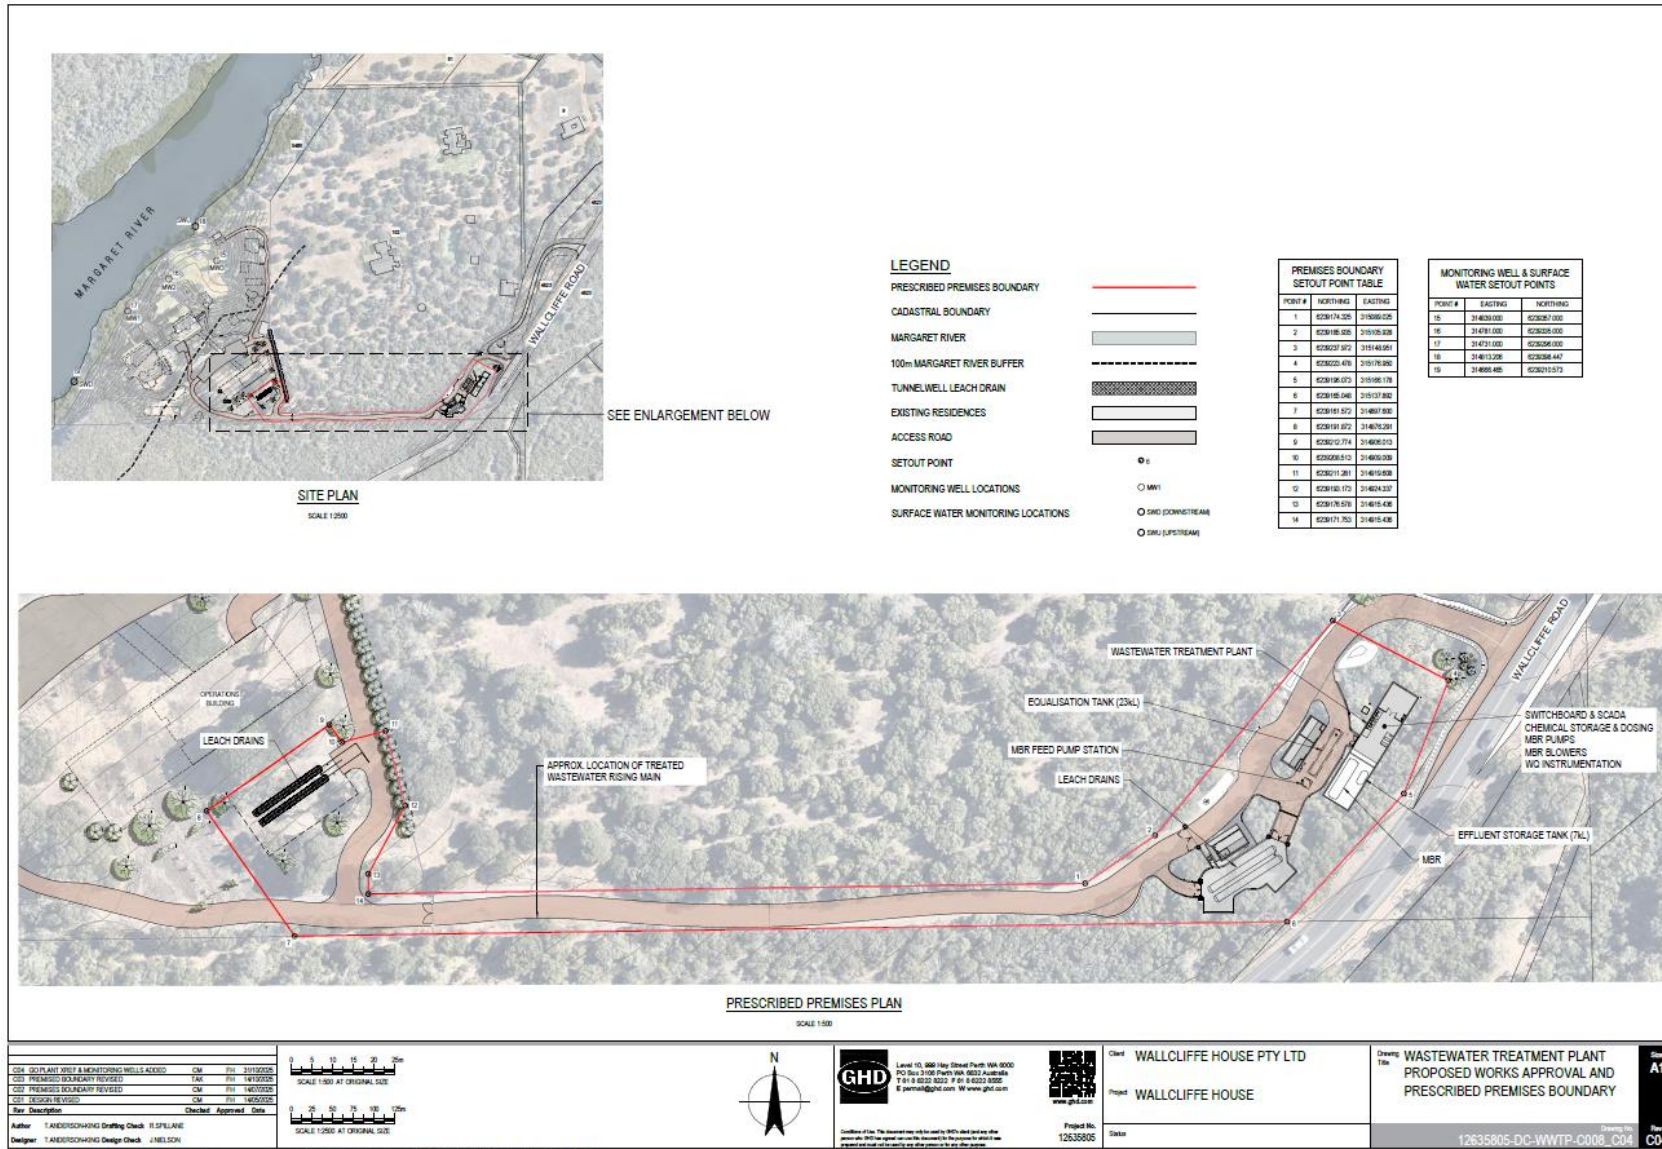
Location of WWTP and Leach Drains (Infiltration Structures)
